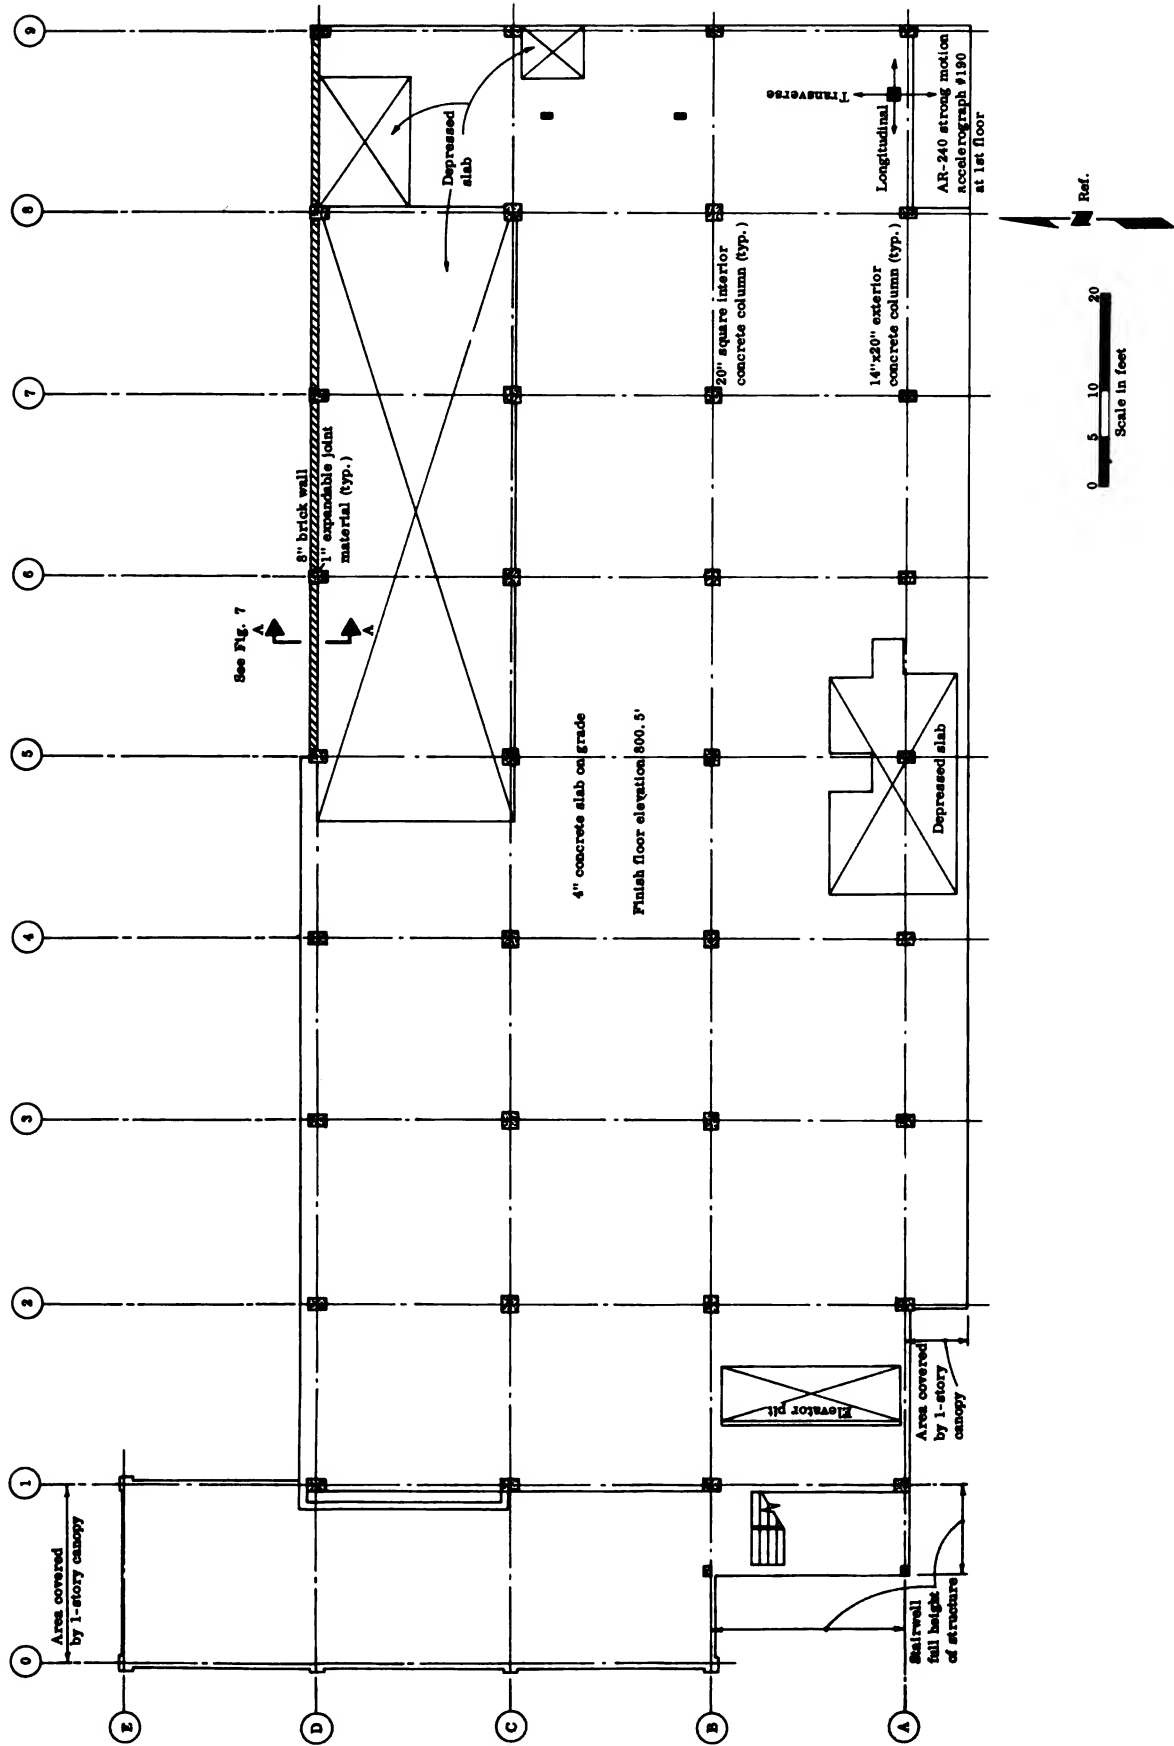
Holiday Inn, Orion Avenue. First-floor plan.
